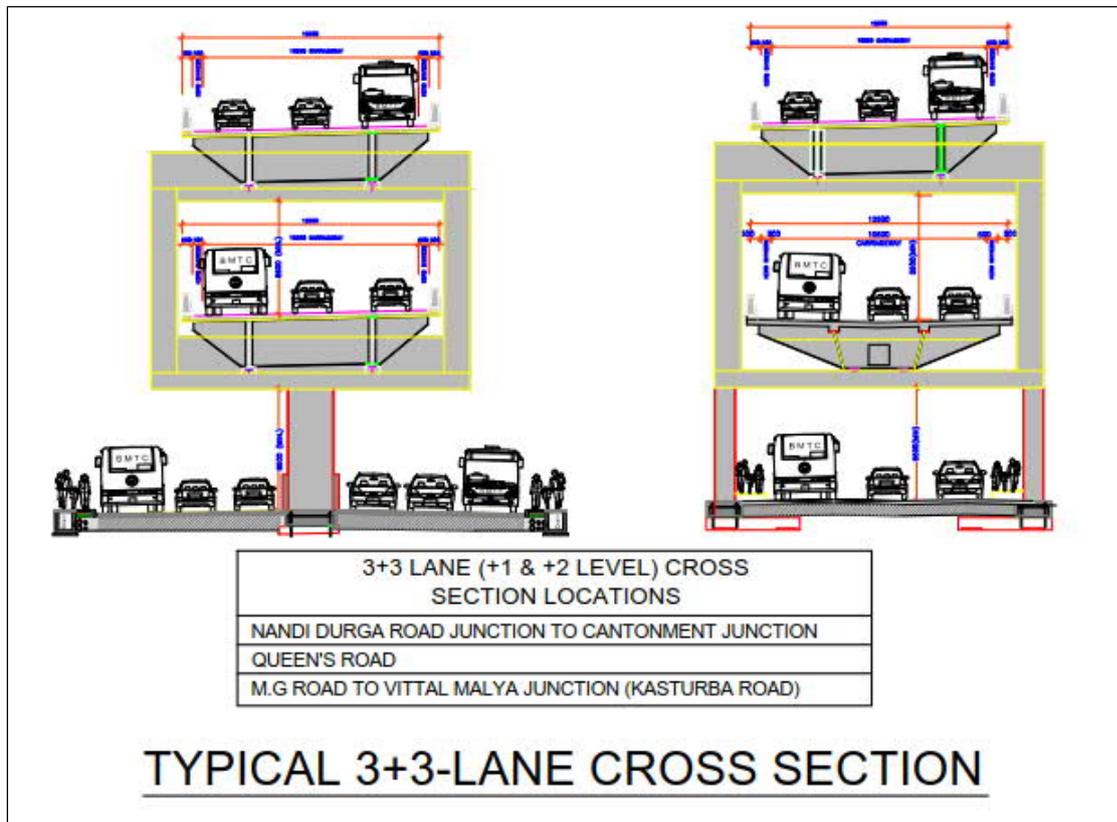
Typical Cross Section for six lane (3+3) elevated corridor
